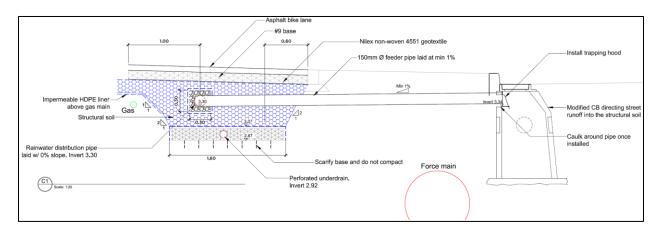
Structural soil STT cross-section. Image source: Green Infrastructure Implementation Branch
